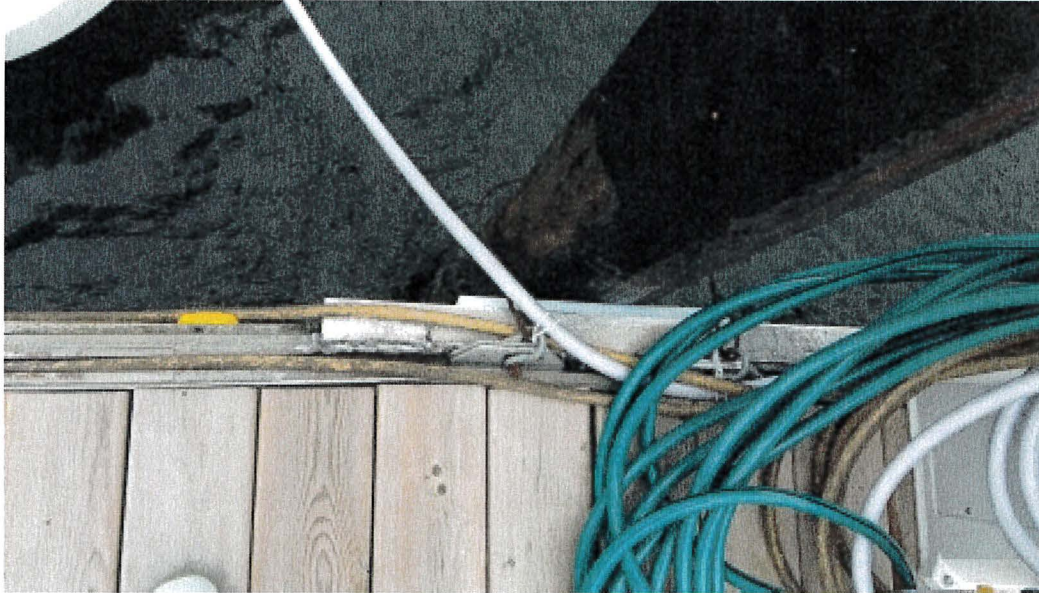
West Main – Dock E. Differential Settlement between E and W sides in Fingers 10/11, 12/13, 14/15 and 20/21
